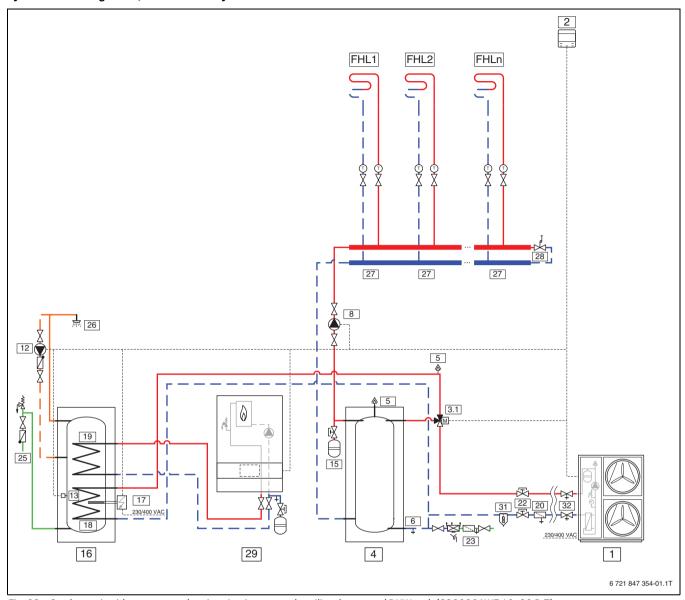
Outdoor unit with one or many heating circuits, external auxiliary heater and DHW tank (CS2000AWF 18 -30 R-T)
